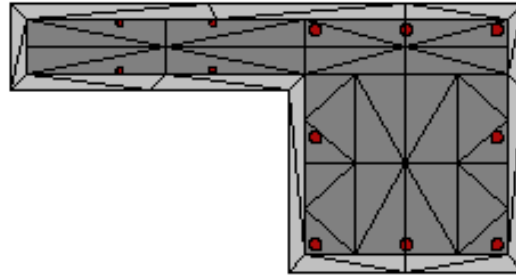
Outer beam fiber section of T- beam section 0.4x0.35 (8 No.18) for 15 story.
